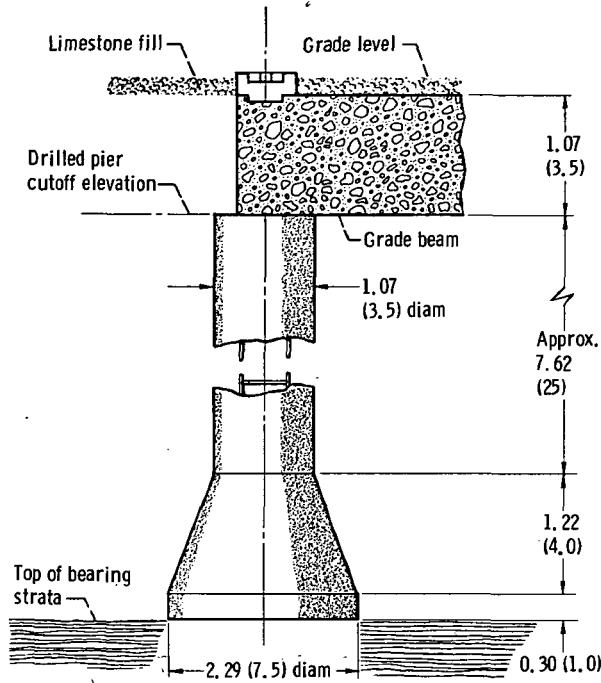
Elevation view of typical pier and grade beam. (Dimensions are in meters (ft).)
